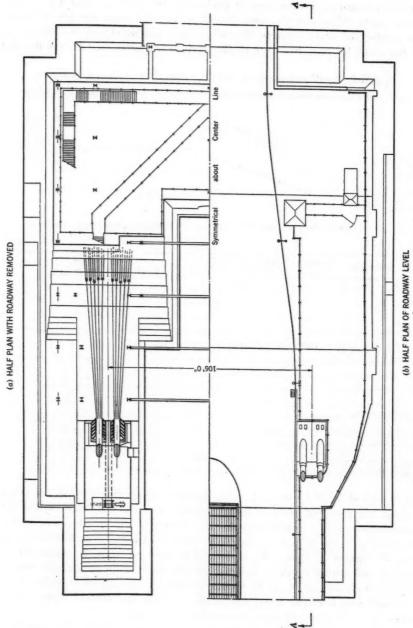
PLAN OF NEW YORK ANCHORAGE (SEE, ALSO, FIGS. 5 AND 6).
